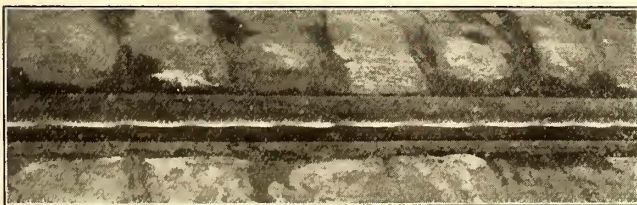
Rail on Tangent in Paved Street in Berlin, Showing Slanting Corrugations
